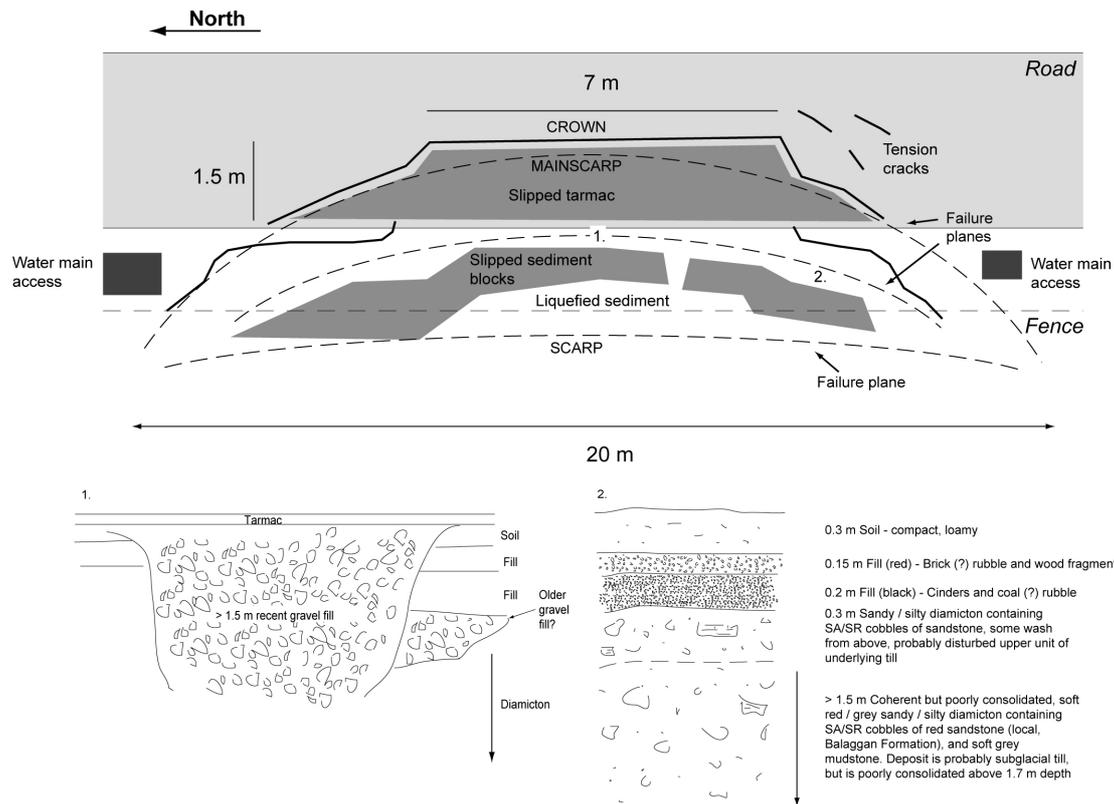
Schematic plan drawing of the mainscarp of the failure, showing locations of principal failure planes, backscarps, slipped material and the two vertical sections (1 & 2) shown below. Not to scale. 1. Vertical section through recent gravel infill at the centre of the mainscarp, and 2. Vertical section through in situ sediments and fill at southern end of mainscarp.
